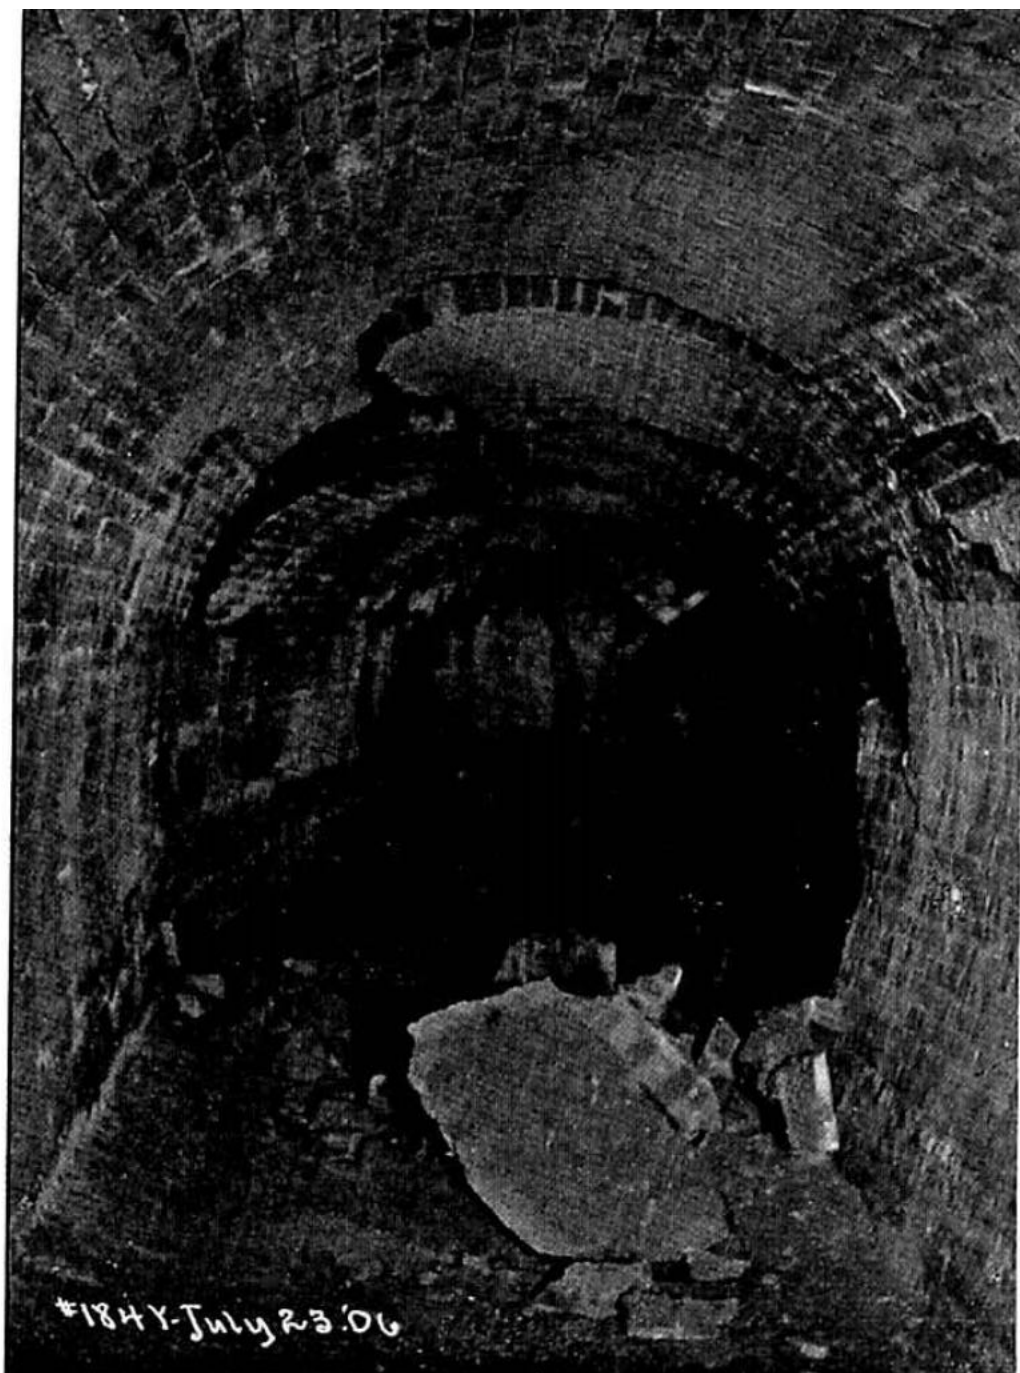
Wastewater Tunnel looking southerly (photo: Schussler 1906)
